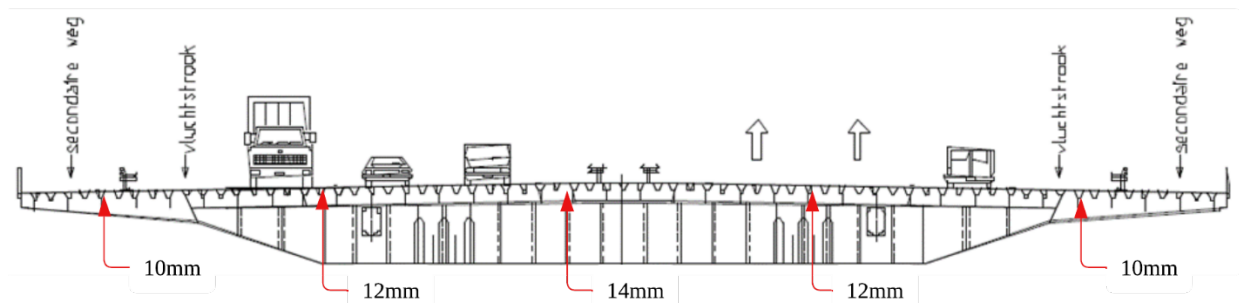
CROSS-SECTION OF THE MOERDIJK BRIDGE WITH DECK PLATE THICKNESS (DEN BESTEN, 2012) (BUITELAAR & BRAAM, 2008).
